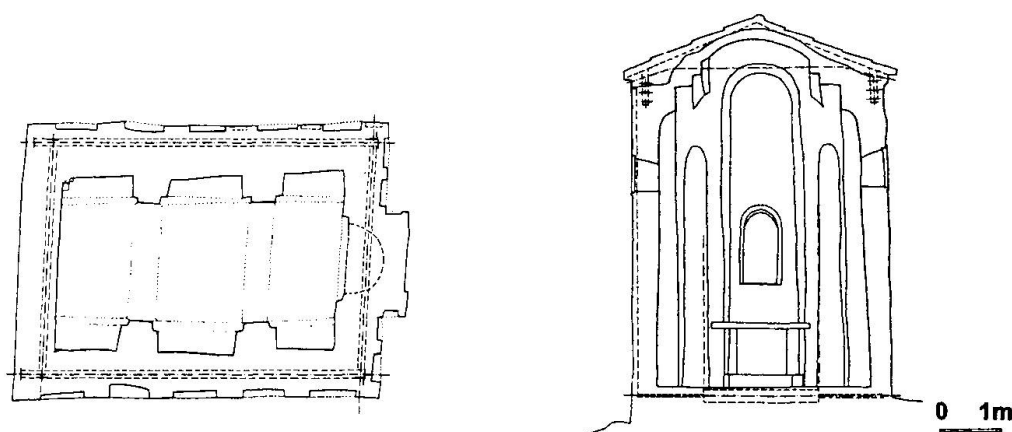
Strengthening of the church of St. Mihajlo: plan (left) and section (right)
